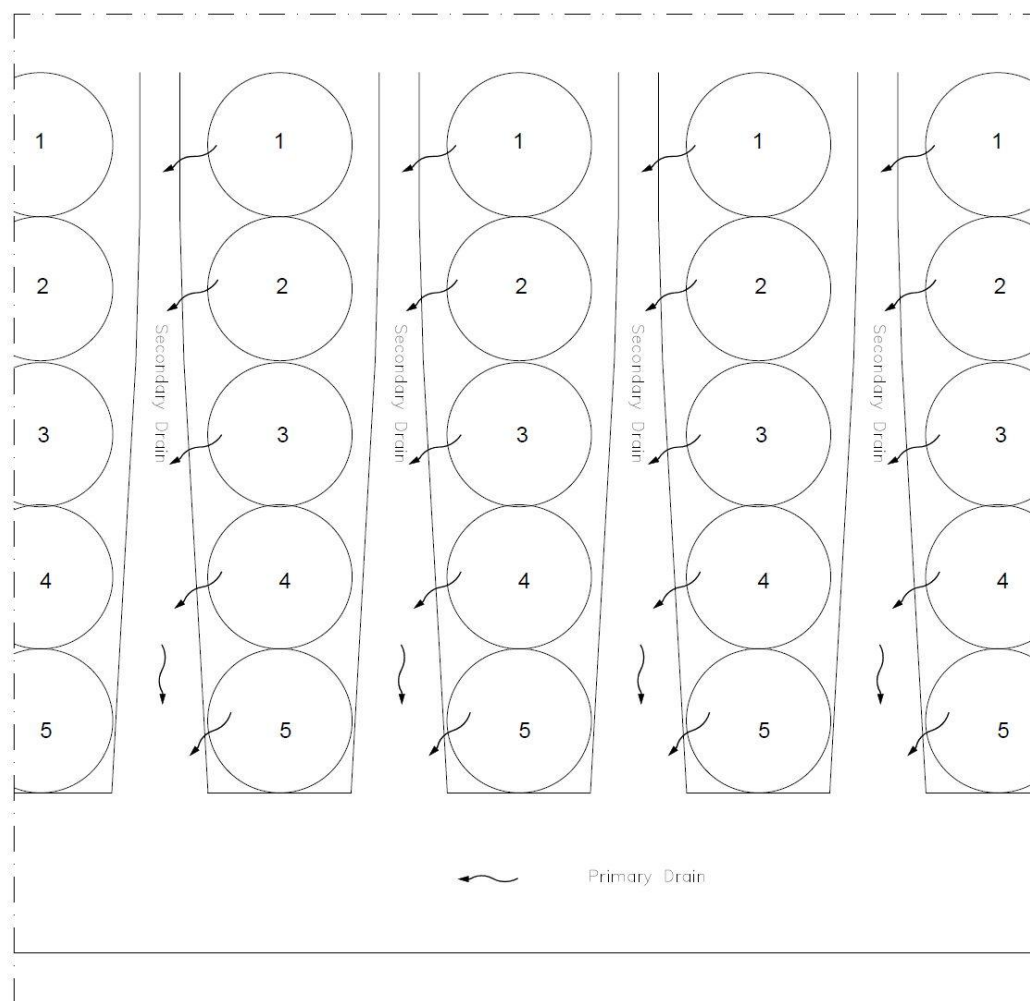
Schematic layout of drainage system for fields towards the secondary drains
